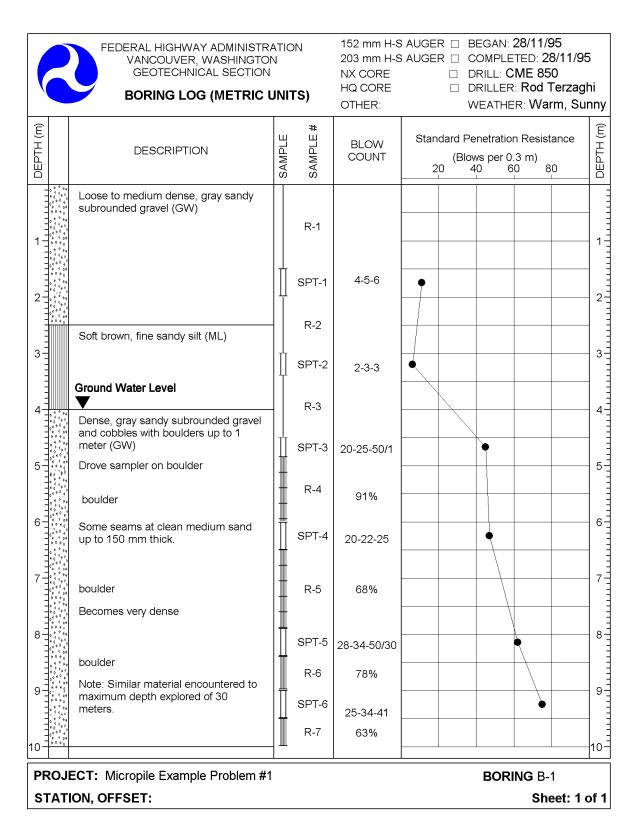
16. Sample Problem No. 1 - Soil Boring Log
